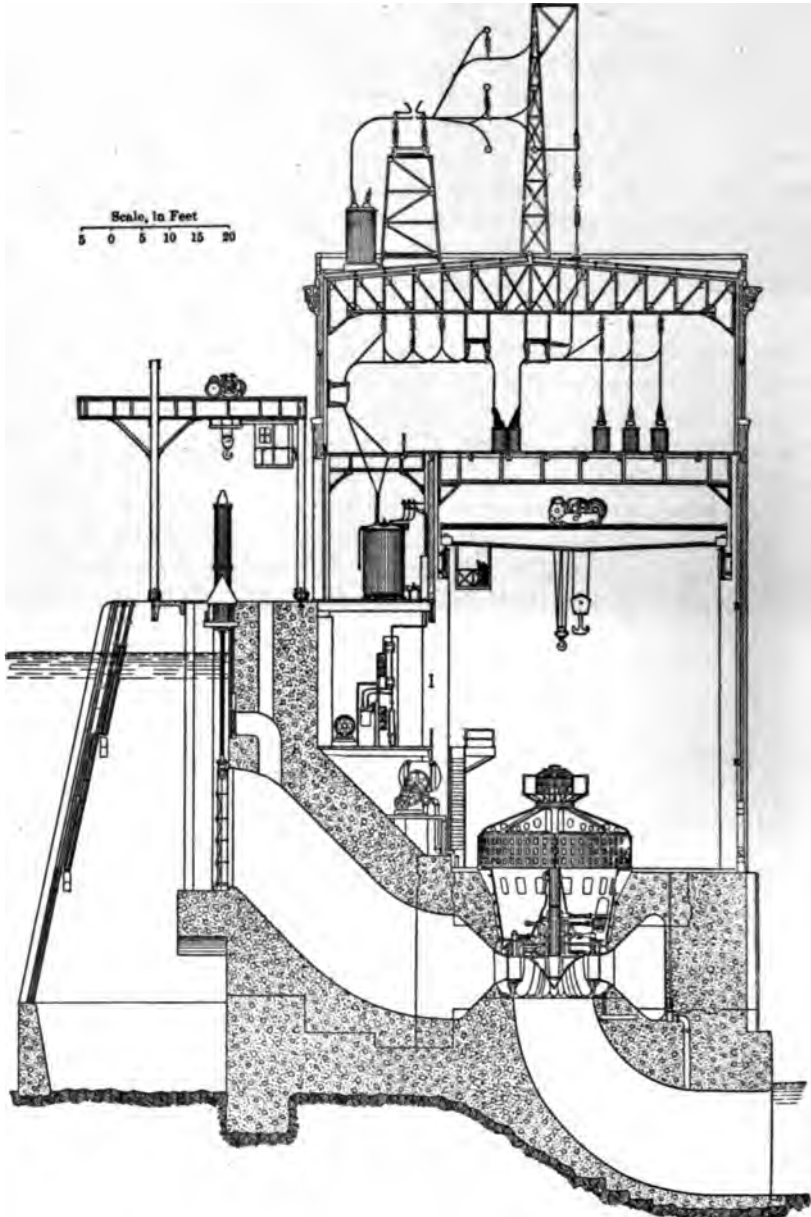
Typical cross-section of power house, Coosa River, Lock 12 development.
